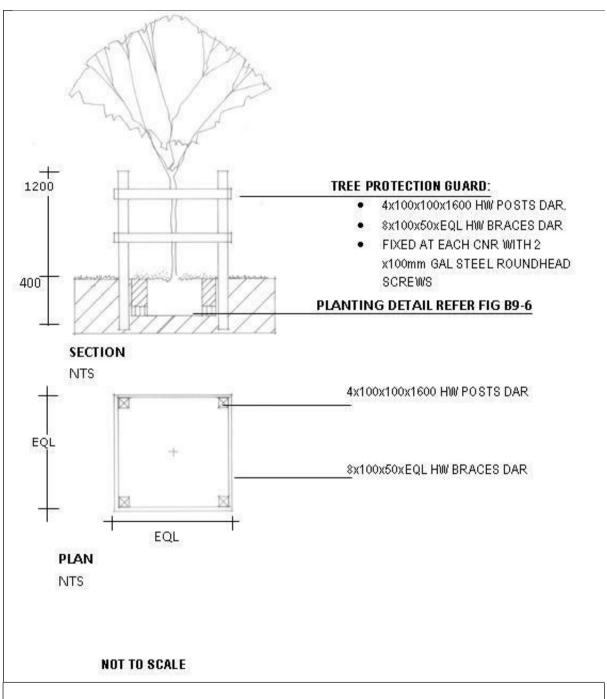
Tree Protection Guard Detail for Permanent Protection
